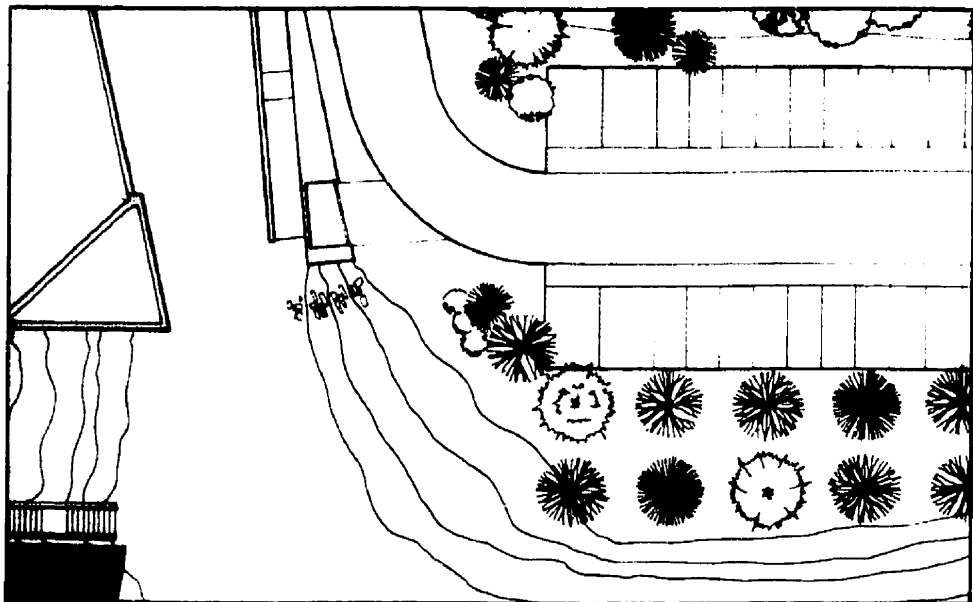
Plan drawing of the colonnade of trees. The tree grove is situated east of the building and south of the parking.
